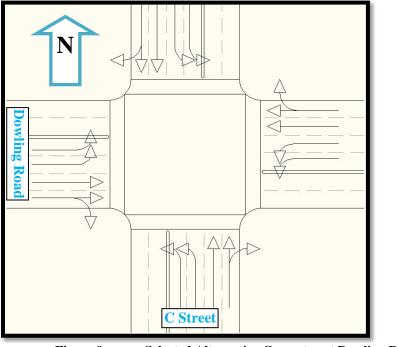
Selected Alternative Geometry at Dowling Road and C-Street
